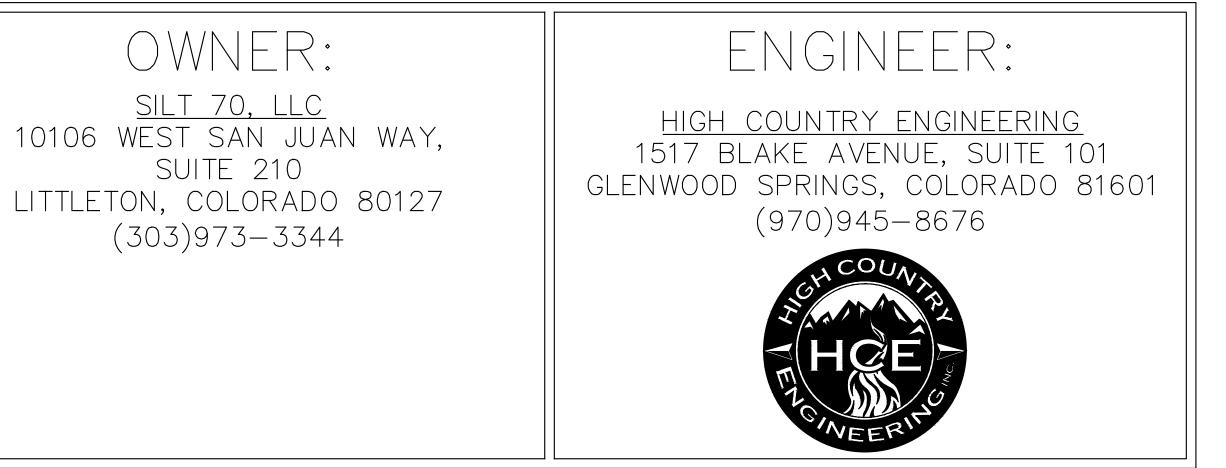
Exhibit E Major Subdivision Preliminary Plat and Civil Engineering Plans
